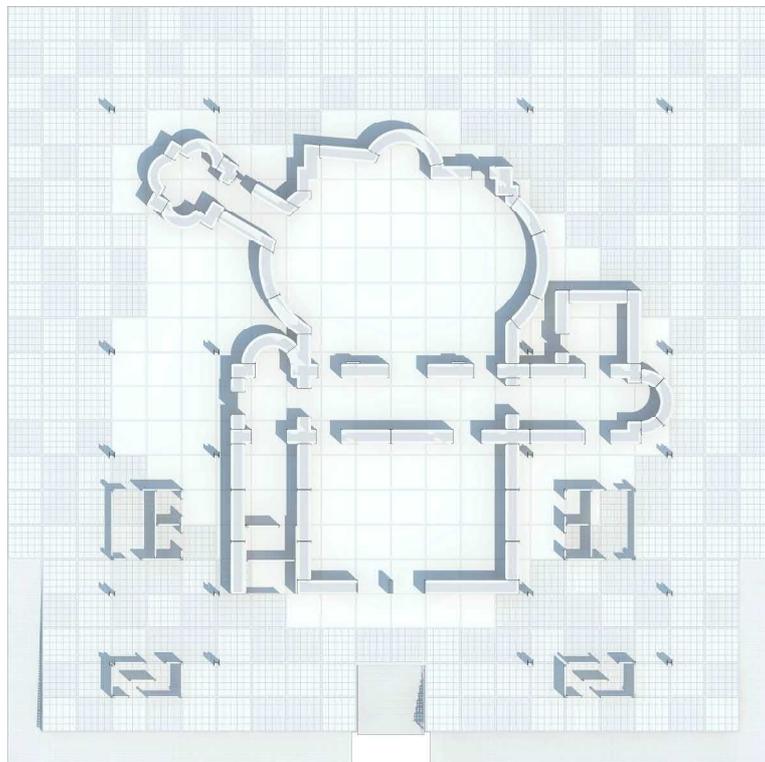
The floor plan of the architectonic proposal. Inside the perimeter walls, a structural glass pavement covers the mosaics underneath. Credit: Arget Toçila.
